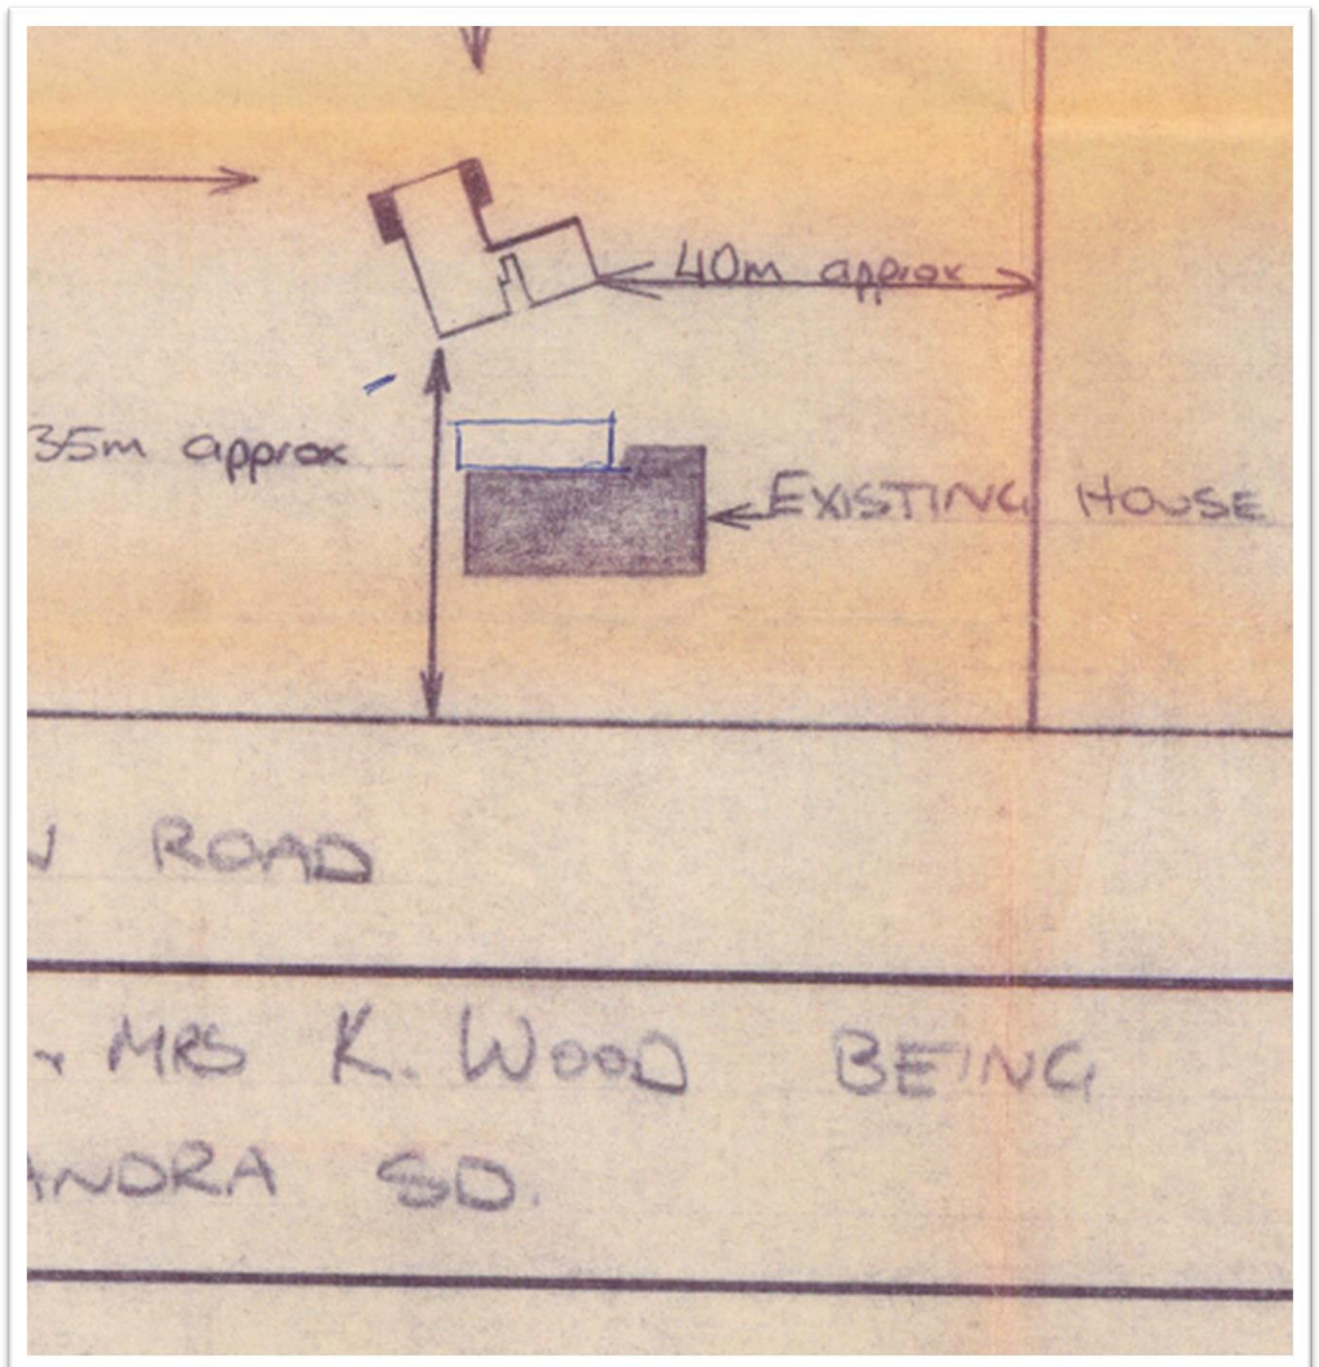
1983 Plans for demolition of existing house and construction of new dwelling.
